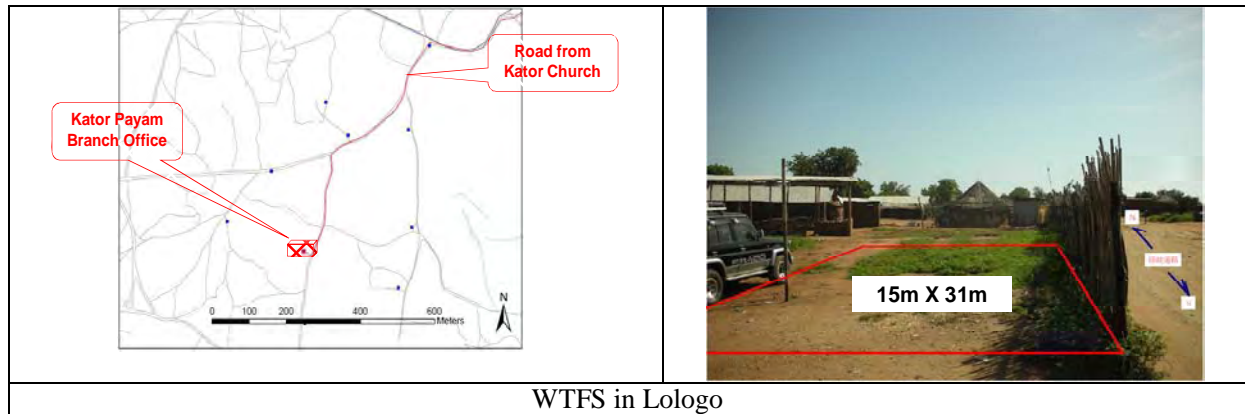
Detailed Locations of Proposed Facilities (3)
